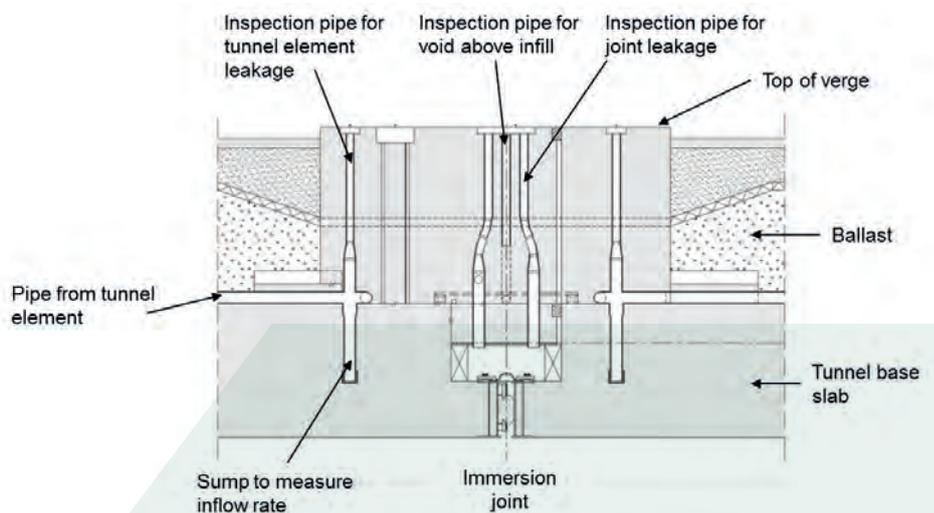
Inspection pipework installed in Bjorvika tunnel immersion joint. (Long section through verge to side of carriageway shown).
